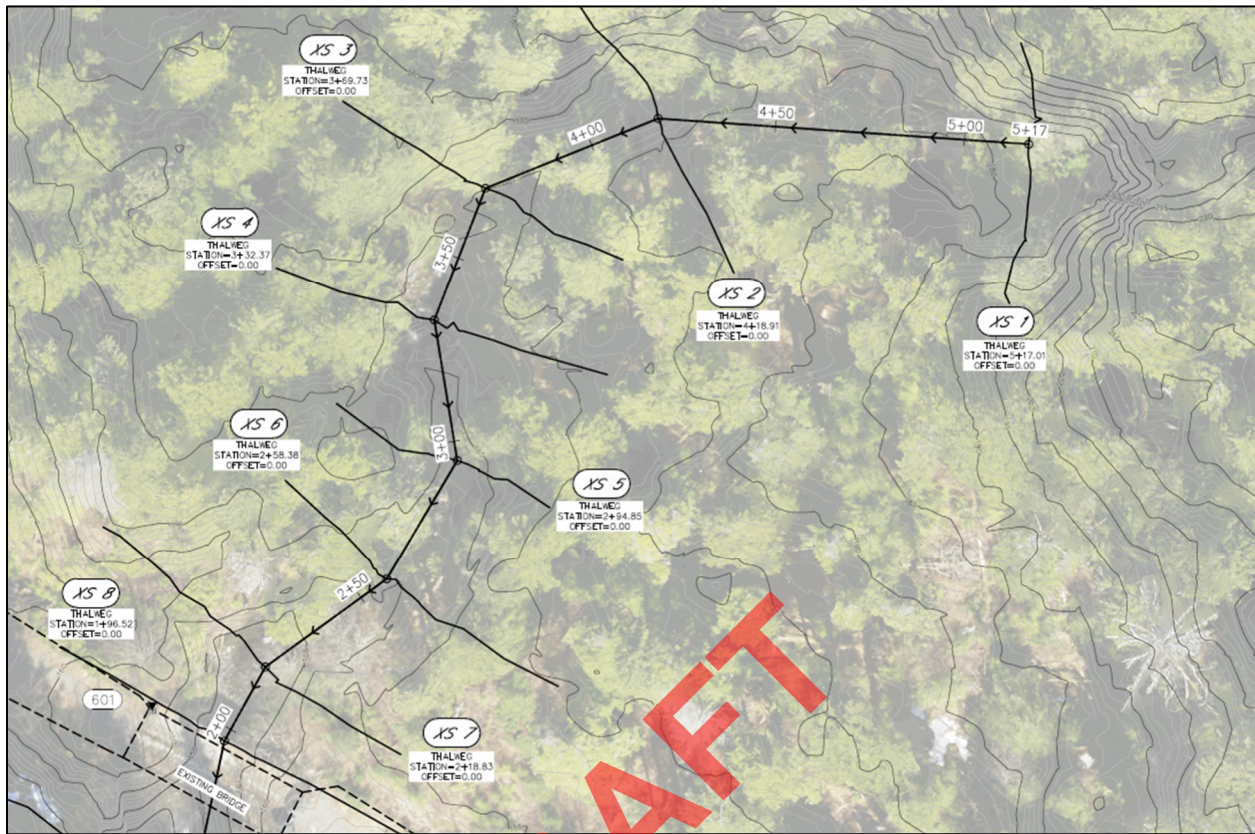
Surveyed cross-sections upstream of the existing bridge.
